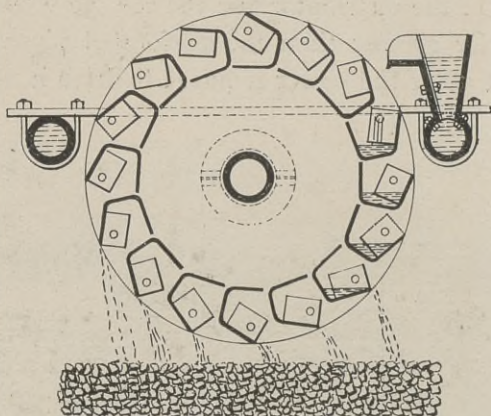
A.—Section of Water-wheel Distributor, Showing Arrangement of Buckets and Feed Pipe.
